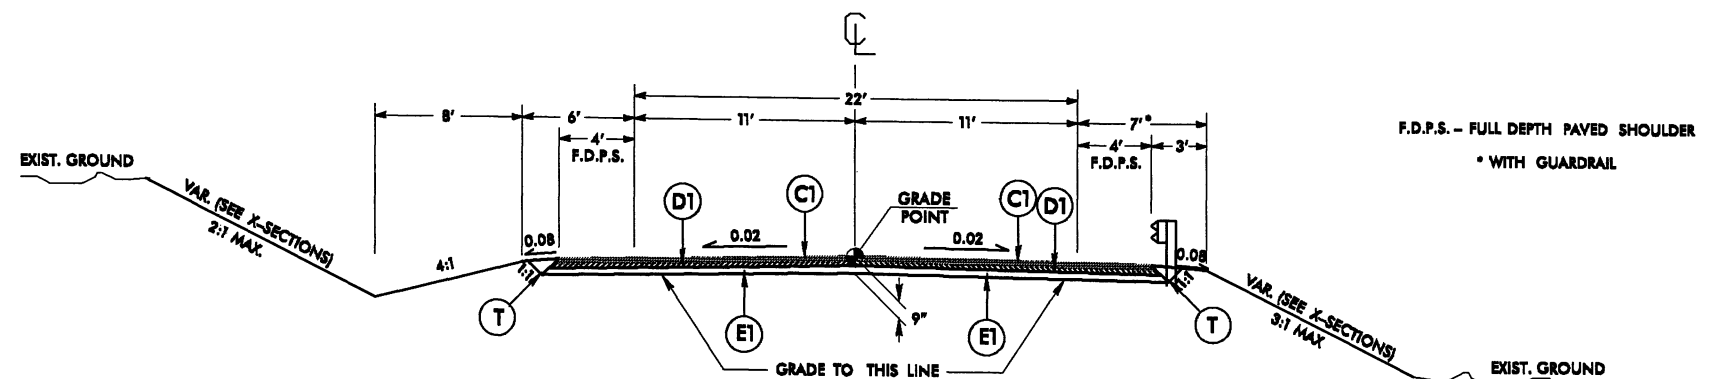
DETAIL OF PAVEMENT TREATMENT AT BEGIN AND END OF PROJECT
